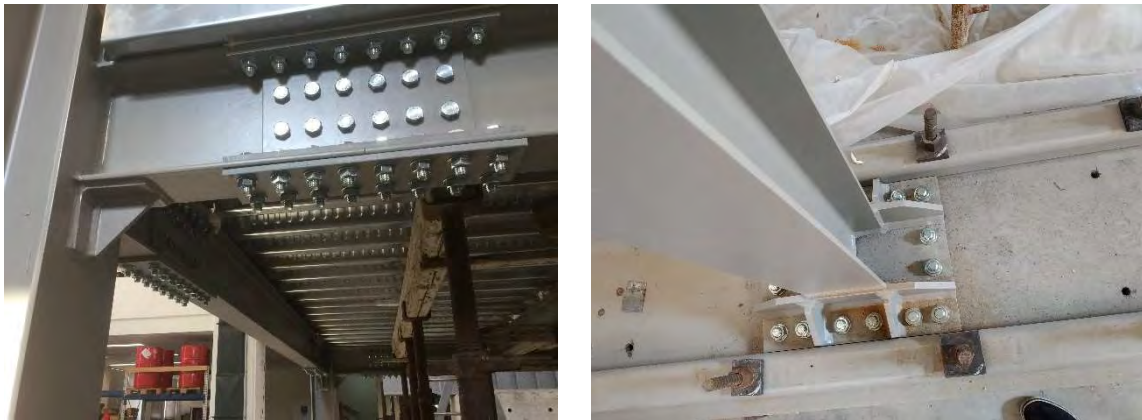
Positions of stiffeners at beam-column connections and at column bases
